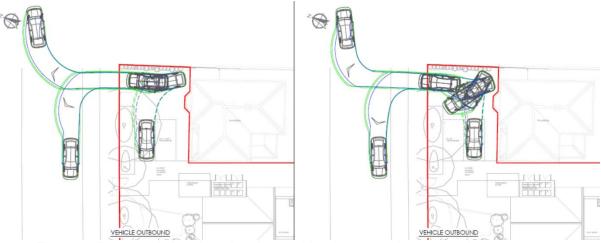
Proposed site plan showing parking layout and swept path manoeuvres.
